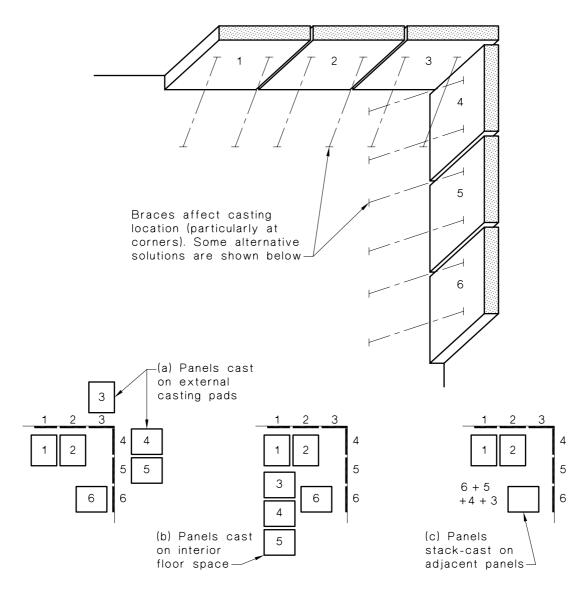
BRACING INFLUENCE ON CASTING LAYOUT
